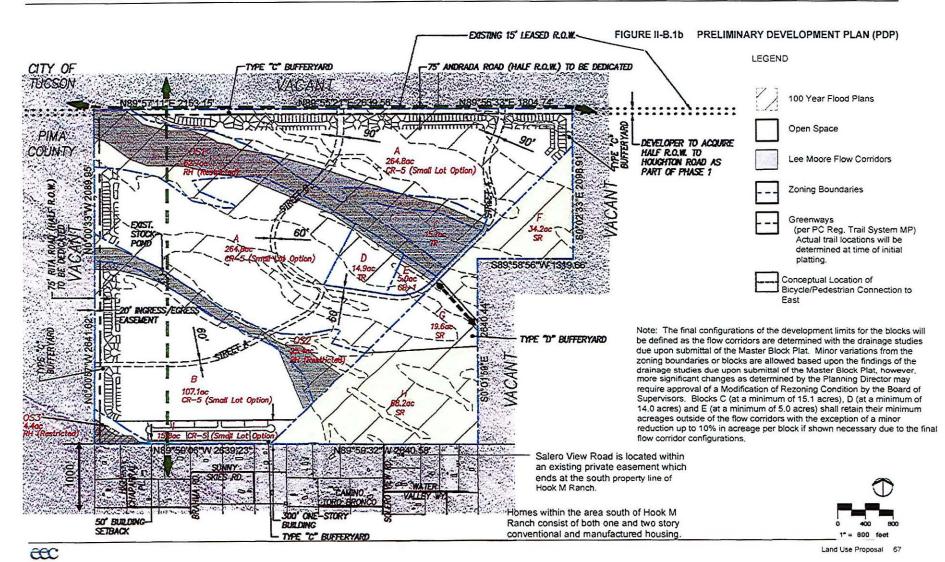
PRELIMINARY DEVELOPMENT PLAN (PDP)
